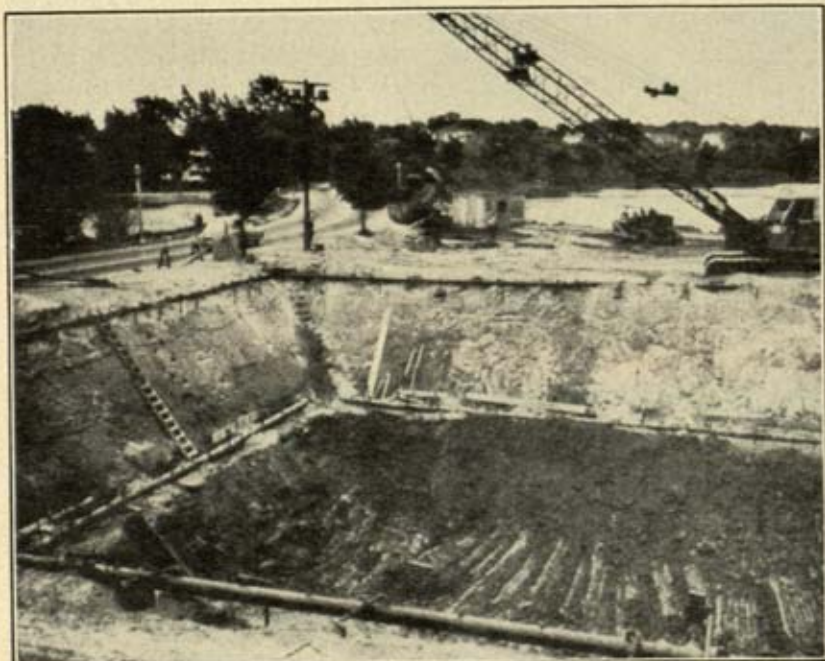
Two-stage wellpoint installation. (*Moretrench Corp.*)
